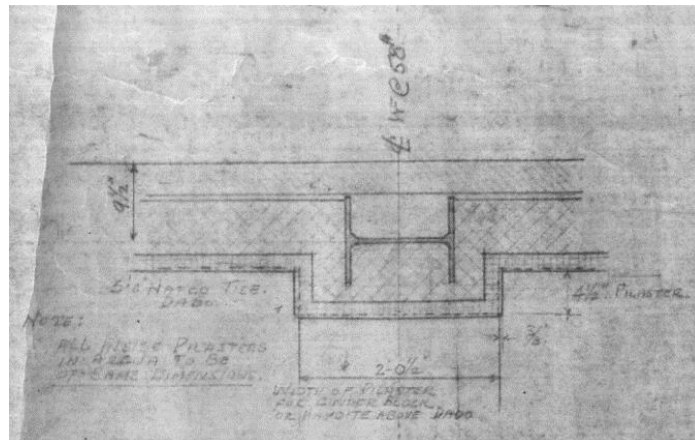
Anticipated masonry pilaster detail at perimeter steel columns (c.1951).
